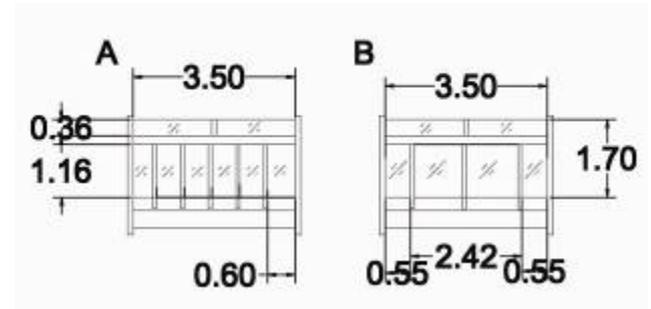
A) Vertical shading elements placed at 60 cm apart, B) A shading element added at the center between two existing shading elements.
